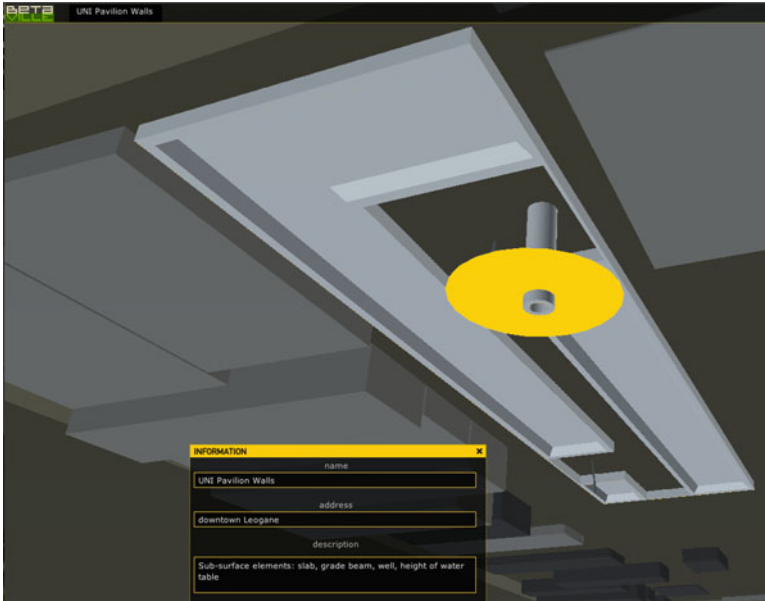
Below-grade detail of proposed academic pavilion for UNI Haiti in Betaville, showing slab, grade beam, well and water table
